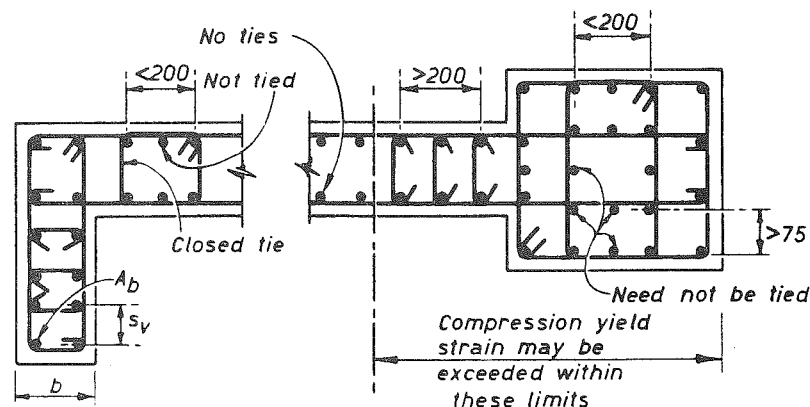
Transverse Reinforcement in Potential Yield Zones of Wall Section
